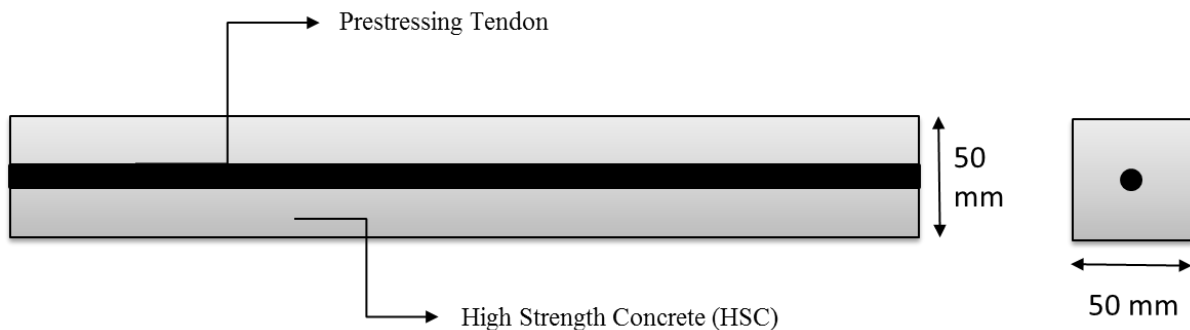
Pre-stressed Concrete Prism (PCP)
